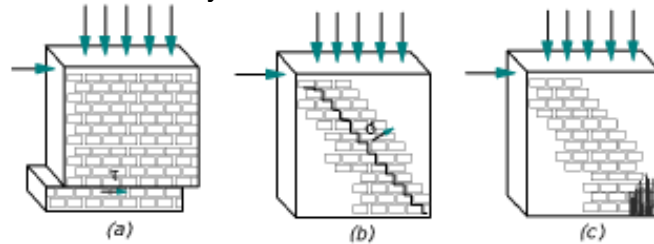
Damage of masonry: from shear forces a) from main tension stresses b) from compression with bending c)
